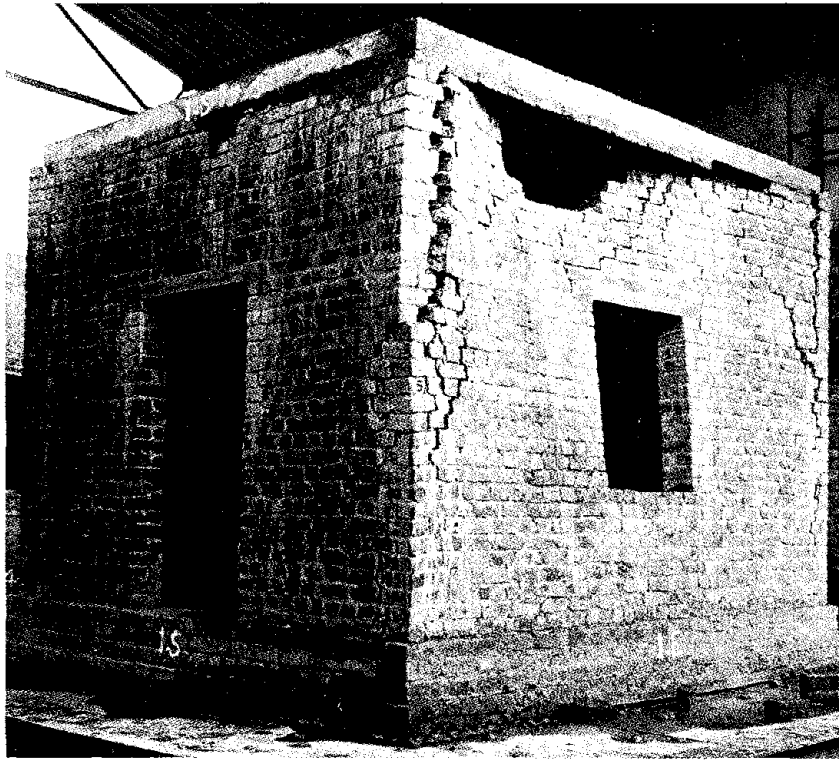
Unreinforced Mud Mortar, Transverse Wall
